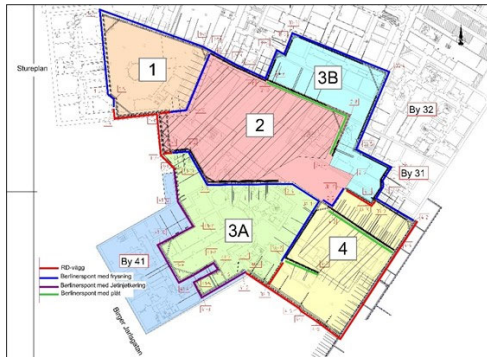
Division of work stages 1 to 4 and location of the reinforced buildings 31, 32 and 41 in the Sperlingens Backe quarter. The hatched areas in Areas 2 and 4 show completed rock excavations. A view of the renovation area marked in red (buildings 51a and b, 52, 31a and b, 41, 42).
